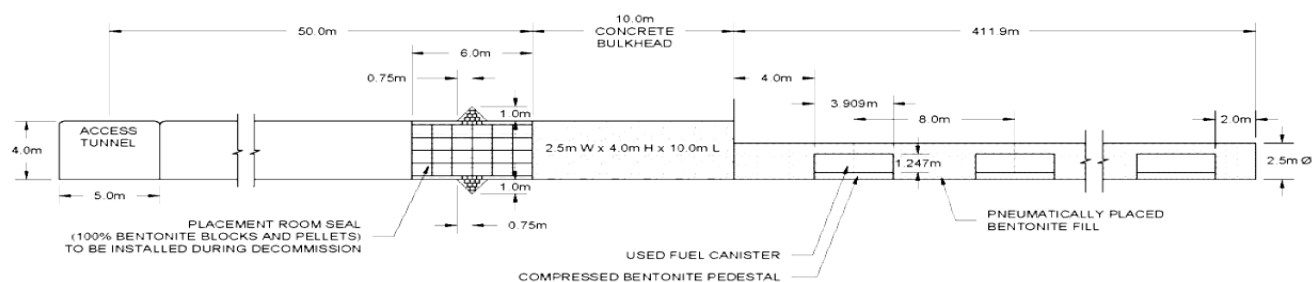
Room layout for horizontal tunnel placement of used fuel containers.
